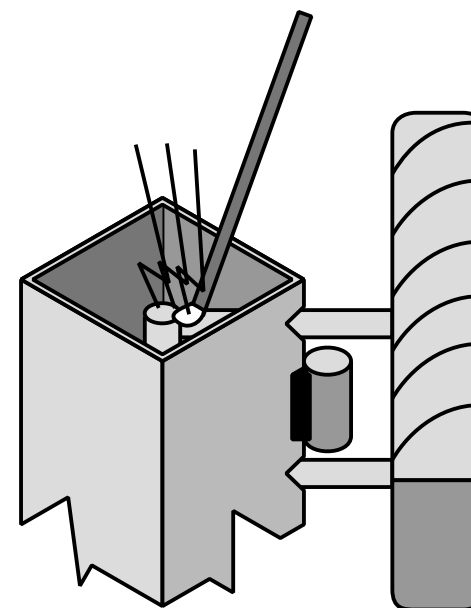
welding re-bar to frames for wooden load pads.
